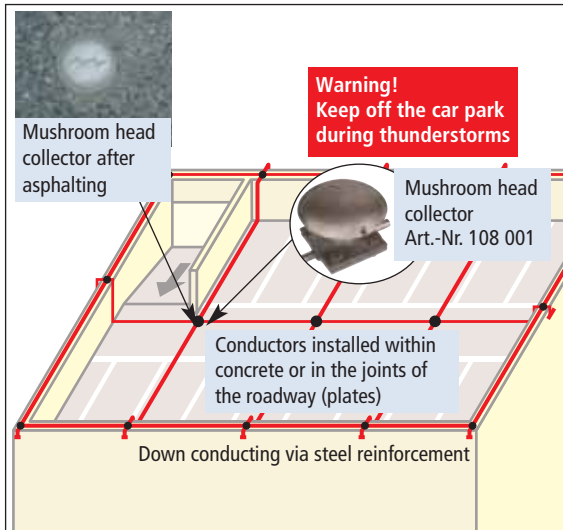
Lightning protection for car park roofs – Building protection
